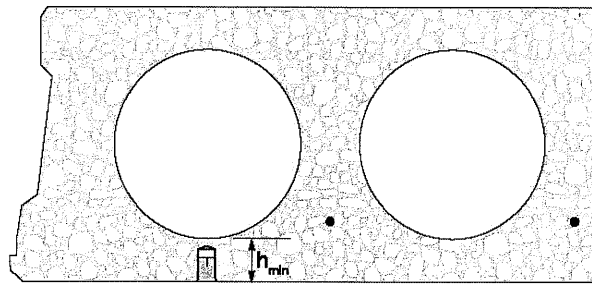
HILTI HDI-P TZ INSTALLATION PARAMETERS IN HOLLOW CORE CONCRETE PANELS
